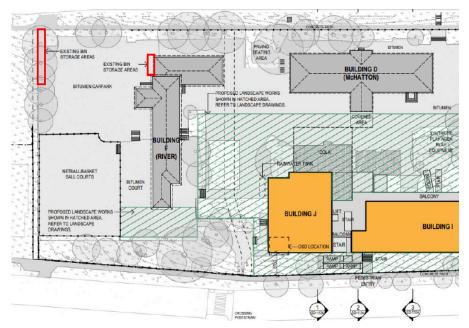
Proposed site plan with bin storage areas identified (Source: Elephants Foot)
